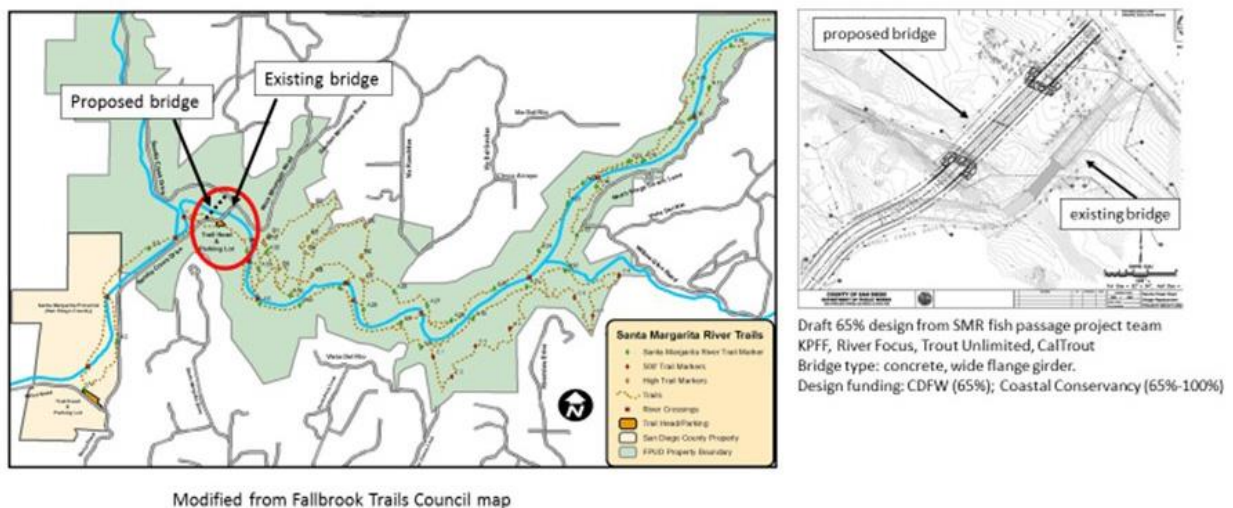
Project Site at Sandia Creek Drive – existing condition and future bridge
